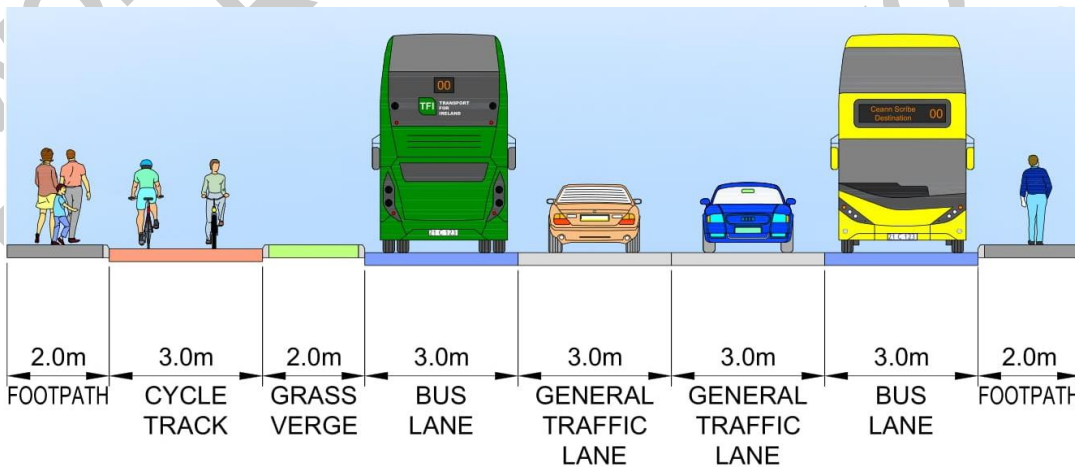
Section 1, Proposed Option 1 – Cross Section A-A
